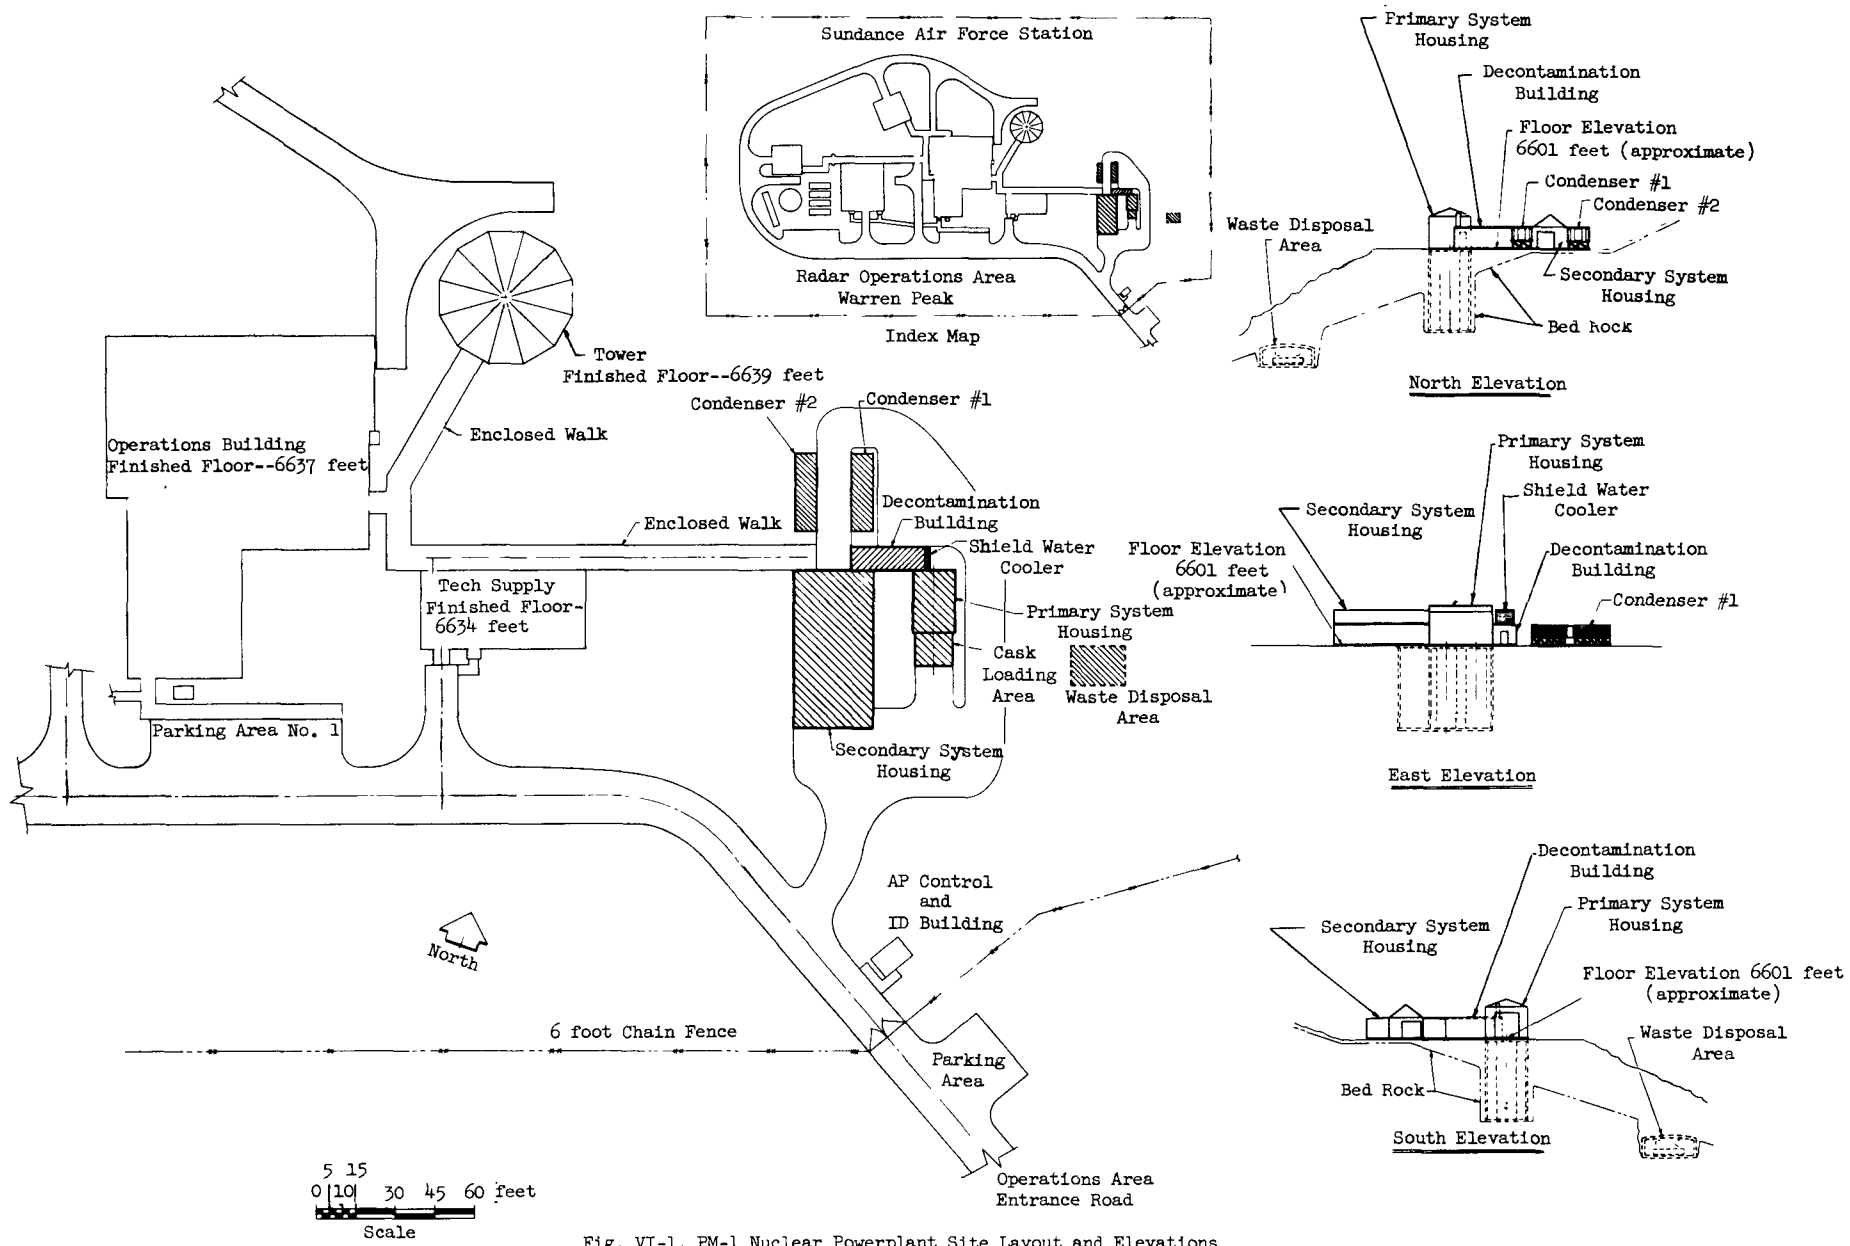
PM-1 Nuclear Powerplant Site Layout and Elevations
